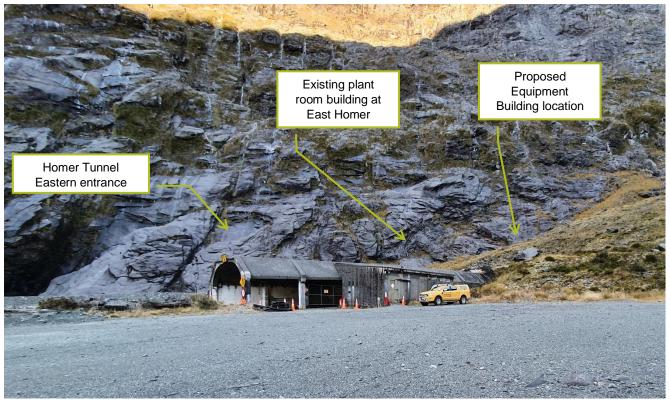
existing plant room adjacent to the Homer Tunnel eastern portal originally known as the "Drill Shed"
